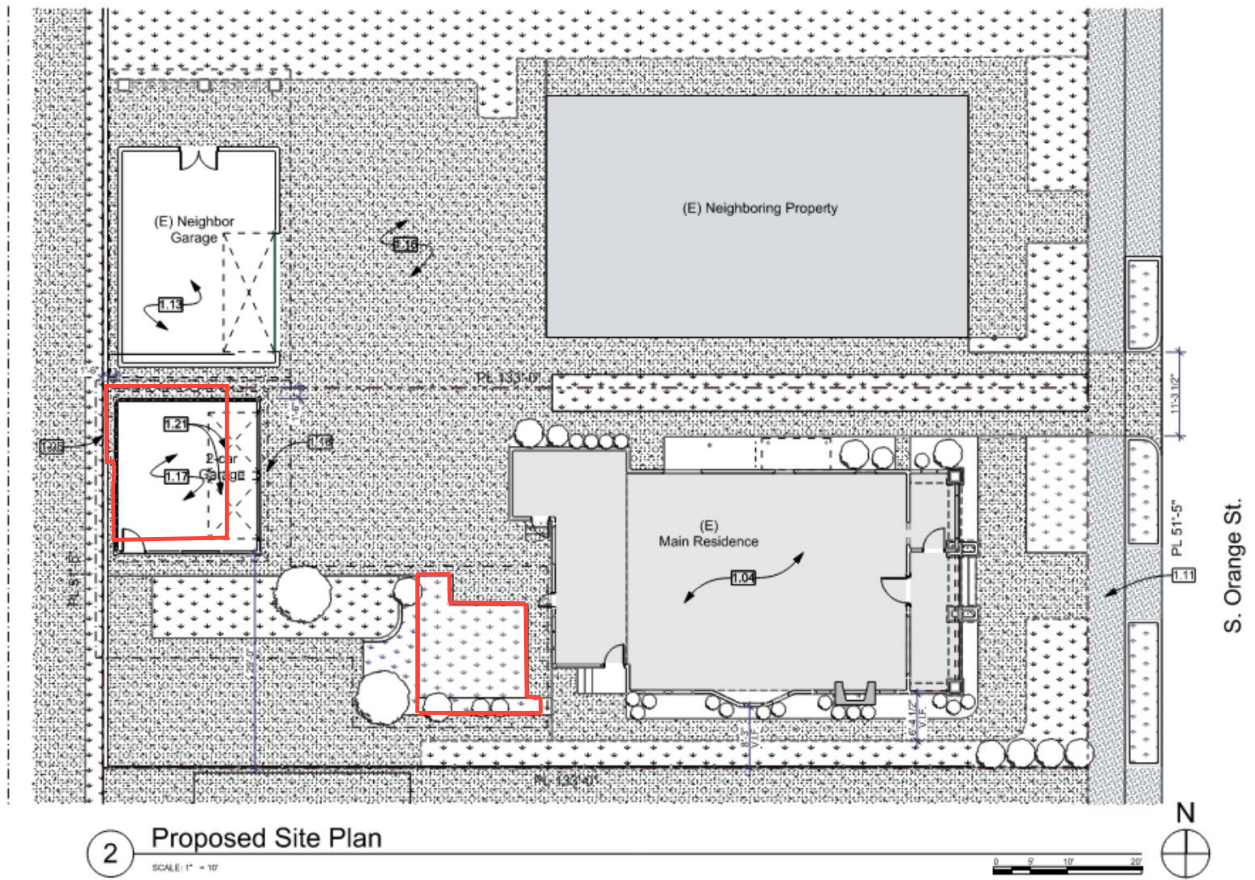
Proposed Site Plan. The approximate footprints of the existing non-historic ancillary building and altered garage are outlined in red. Source: DSEA, Inc., "Purvis Residence, Garage Replacement and Ancillary Building Removal, 220. S Orange Street, Orange, CA 92866," Sheet A-1.0 (February 13, 2026). Edited by Page & Turnbull.
